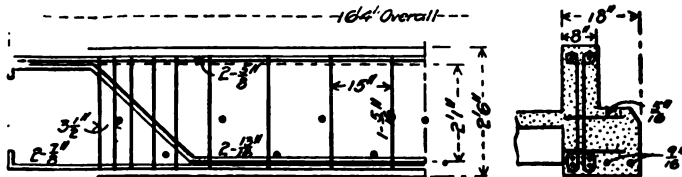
Wall Girder, Bush Terminal Co.'s Factory.
